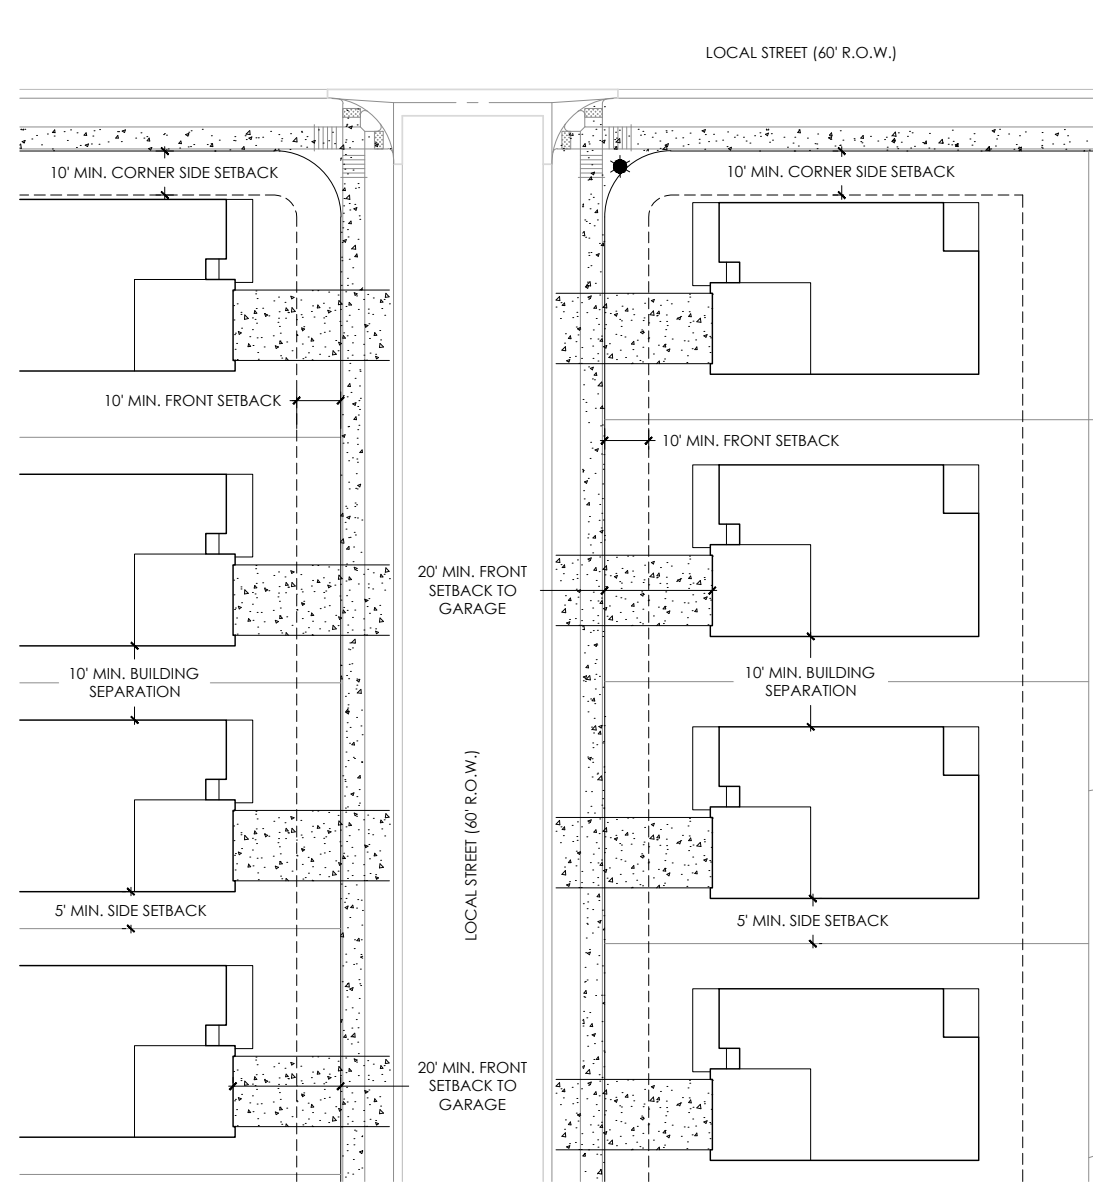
EXHIBIT A - SINGLE FAMILY DETACHED LOT TYPICAL
